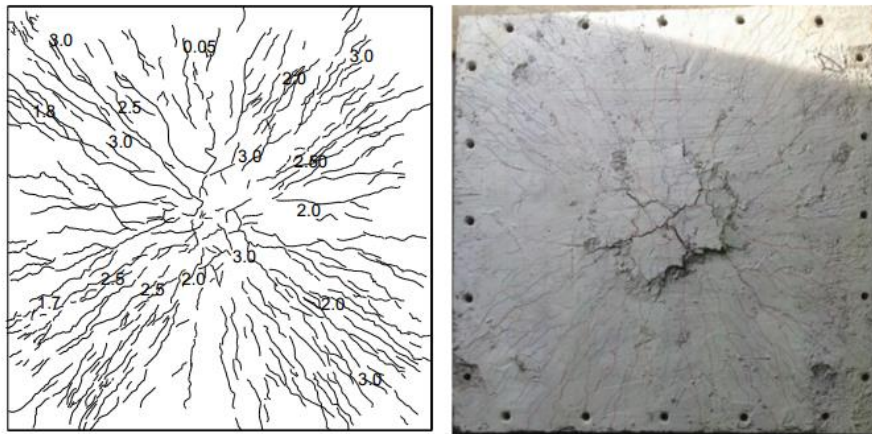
Tension face of the specimen YA200fa, after testing (Numbers indicate crack widths in millimeters)
